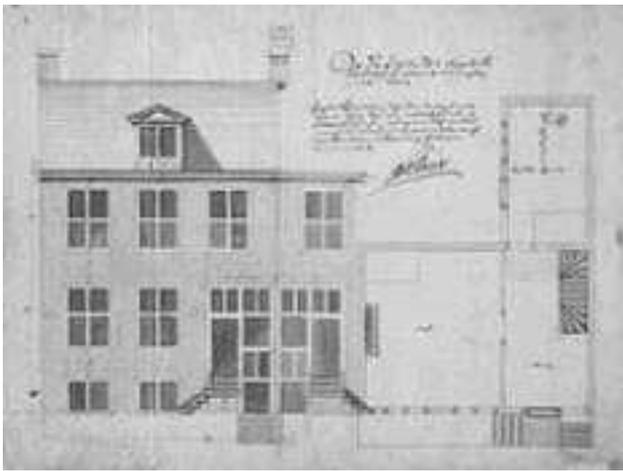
Original drawing of Weavers building (BMA Amsterdam)
